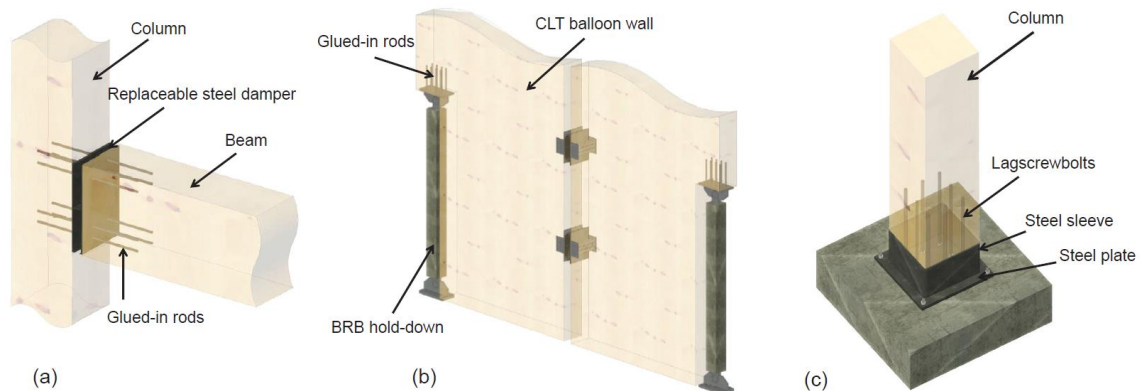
Connection details: (a) beam-column joint; (b) BRB hold-downs; and (c) column-base joint.
